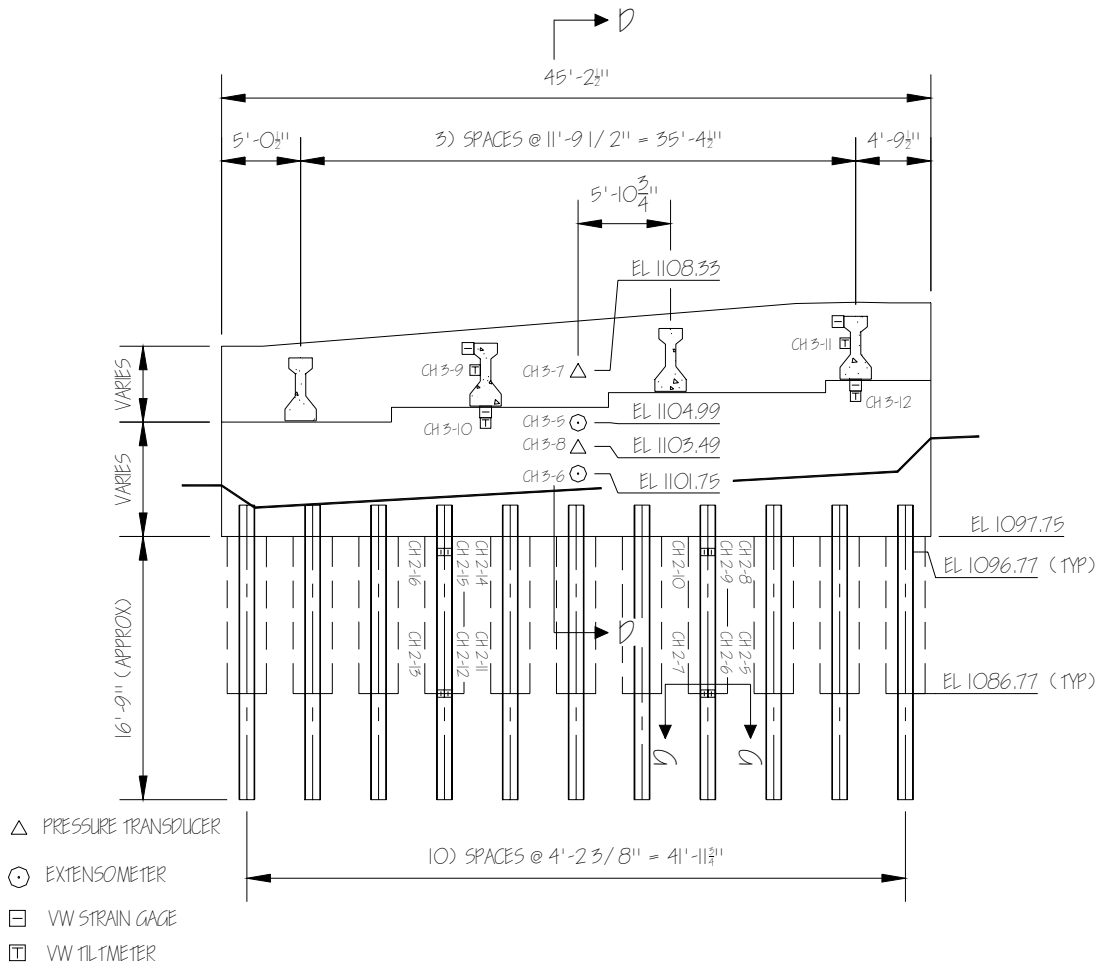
Structure 222 Abutment 1 Elevation (Section C-C)
